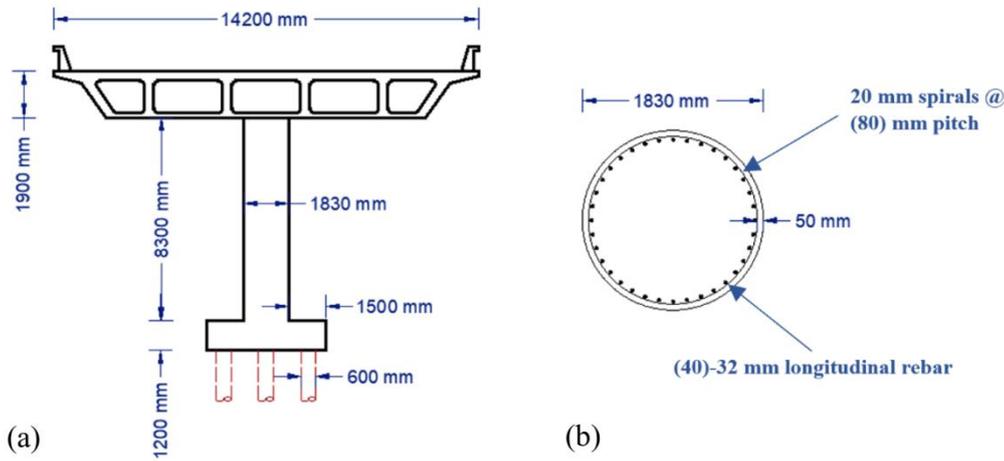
Bridge pier: (a) elevation and (b) cross section.
